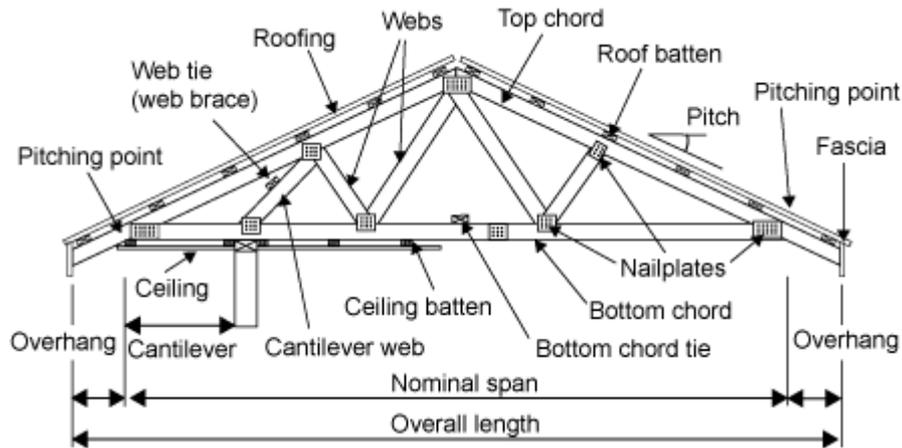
Components OF ROOF TRUSS [Ref no. 9]
